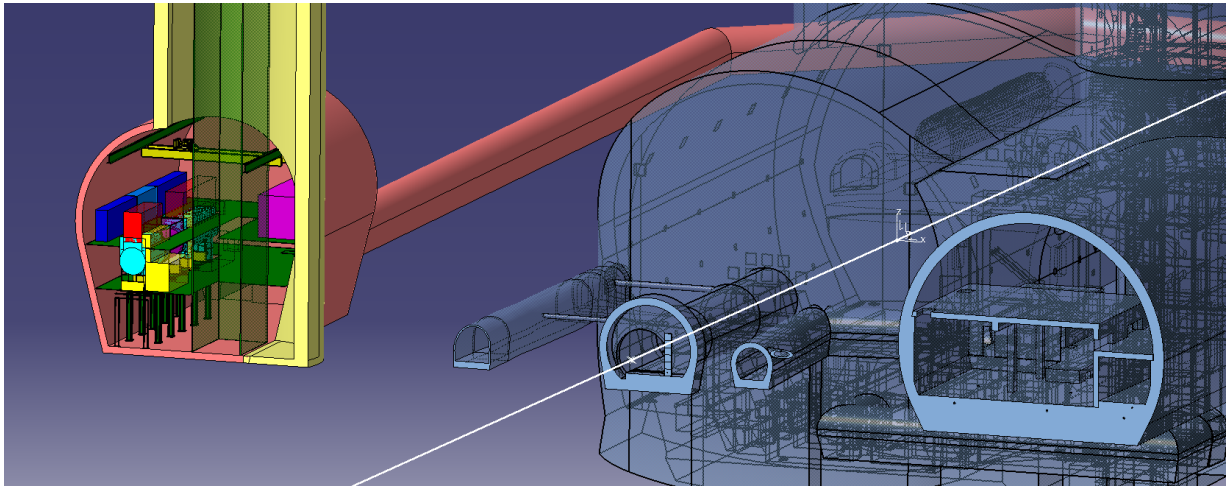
Possible option for underground work at P5 including links to the LHC tunnel. This solution has an independent shaft for access to the surface. A cross-section through the cryogenic equipment is shown. New structures are in light red and yellow.
